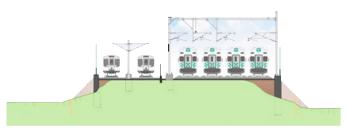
Cross section of rail line on embankment, Ontario Line (Metrolinx)
